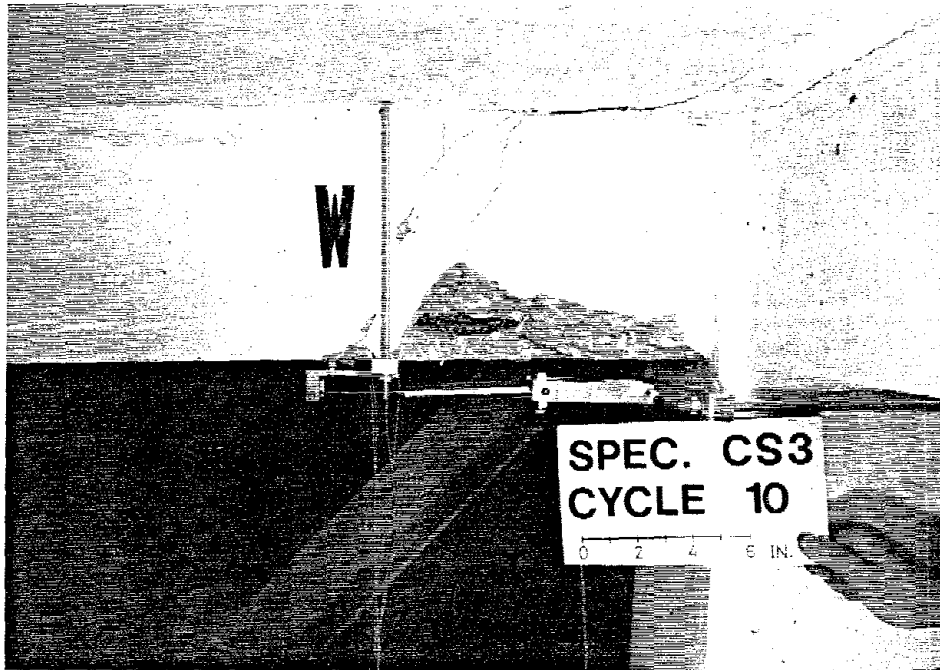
Buckling of Beam Reinforcement in Specimen CS3
